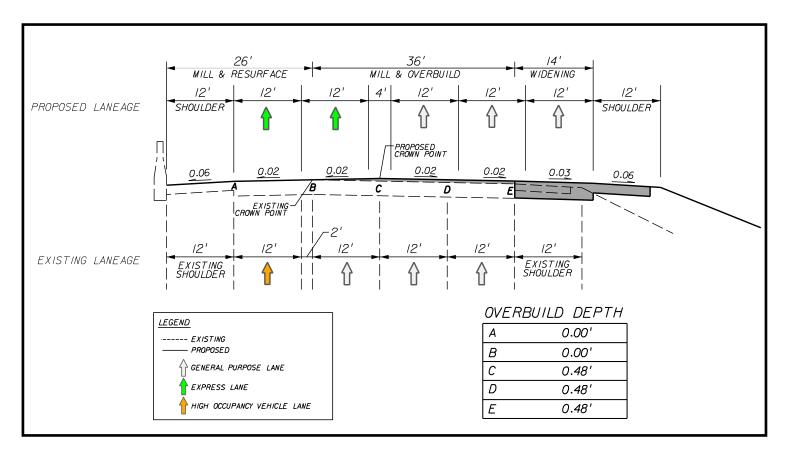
Proposed Typical Section Pavement Overbuild
